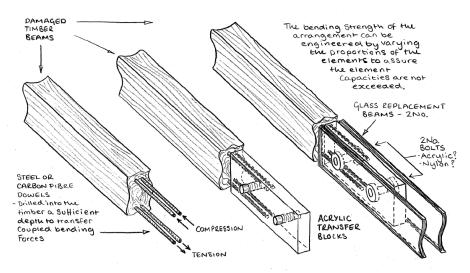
Splice Detail Between Restored Timber and Replacement Glass Beam.
